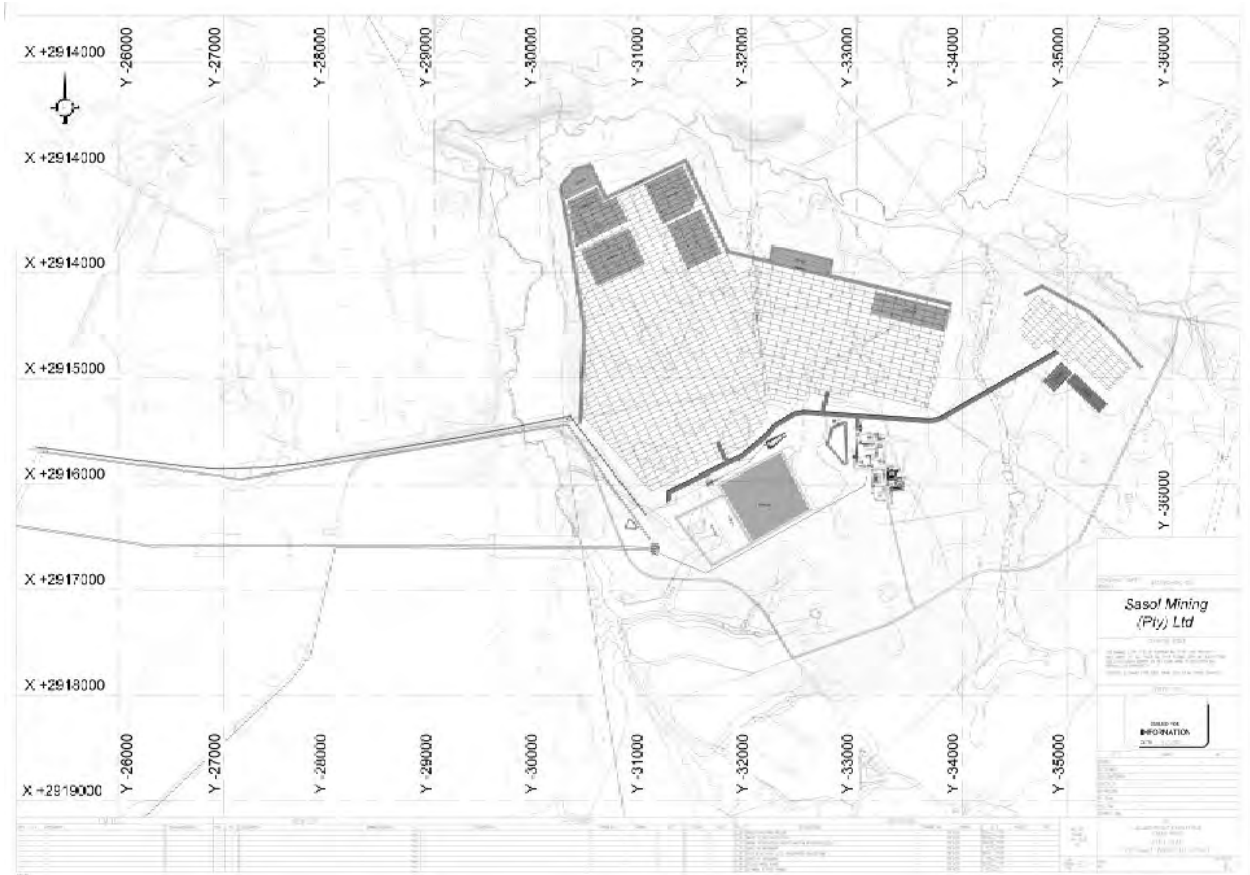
Option 1: Hards and contaminated stockpiles are located within the backfilled opencast area as well as south of Pit 1 (GIBB, 2021).
